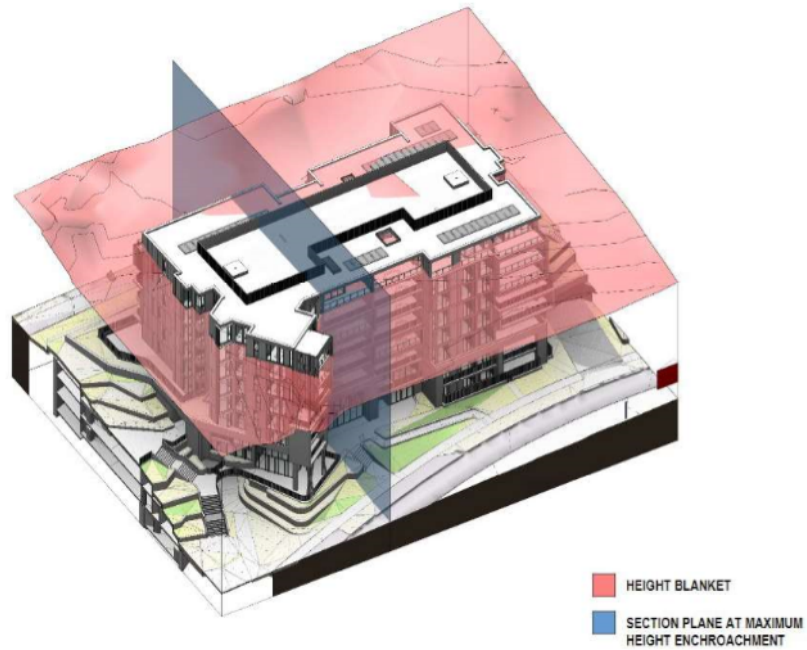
22m Height blanket of Building B (Source: Mirvac Design)
